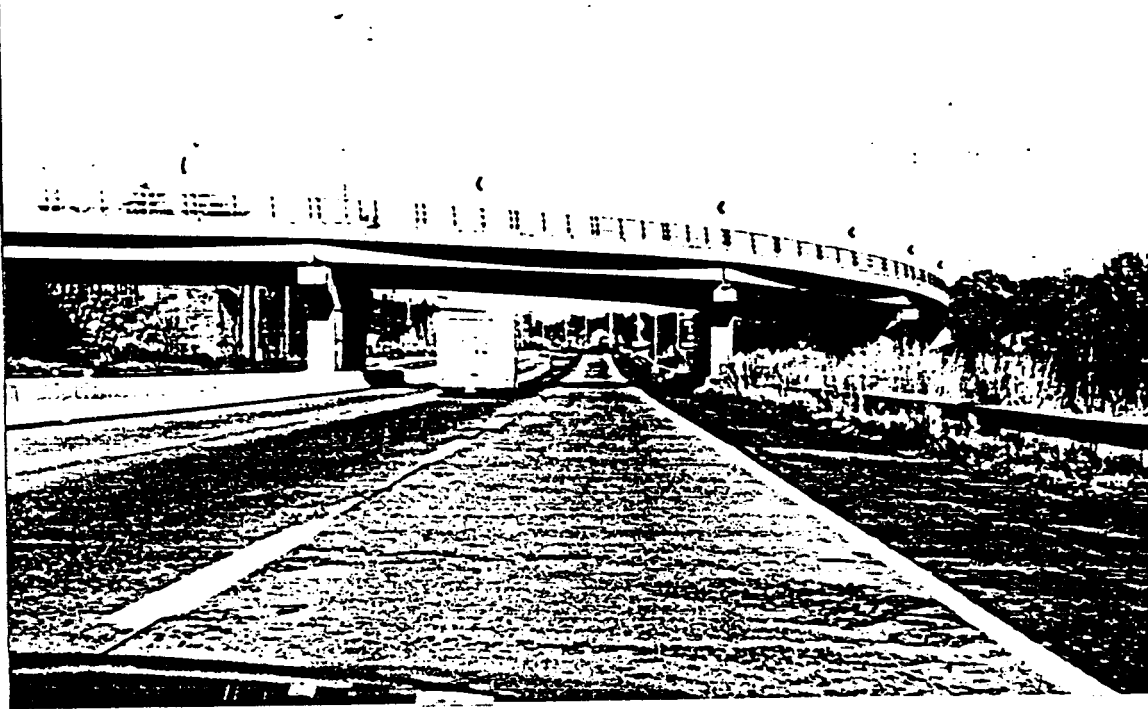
Bridge Pier Blockage, Rt. 21 North at River Rd.
